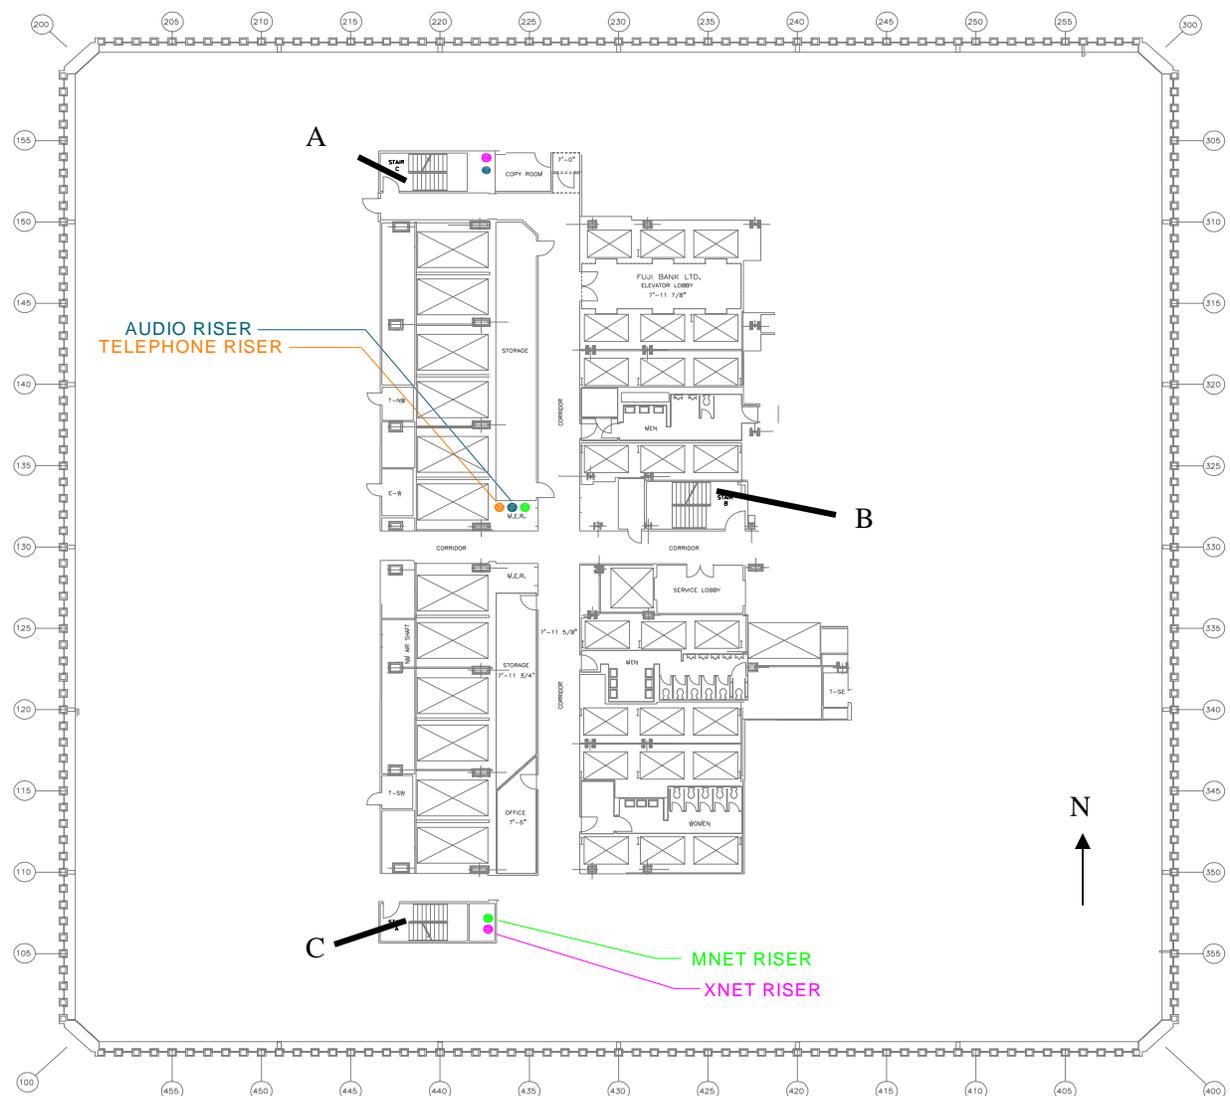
Typical WTC 2 riser locations on impact floors.
